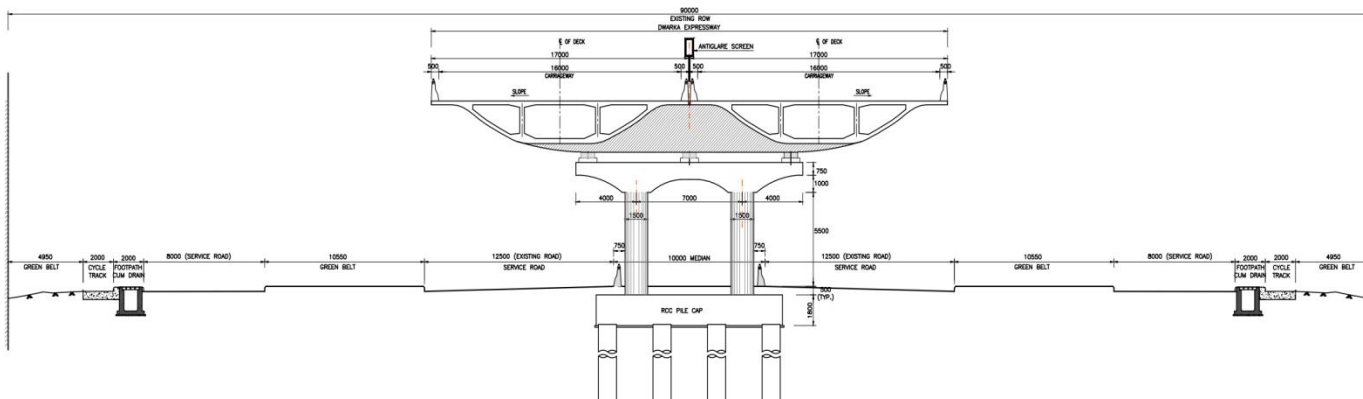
Typical Cross Section (TCS – 2) of Elevated Portion with at grade Service Road
